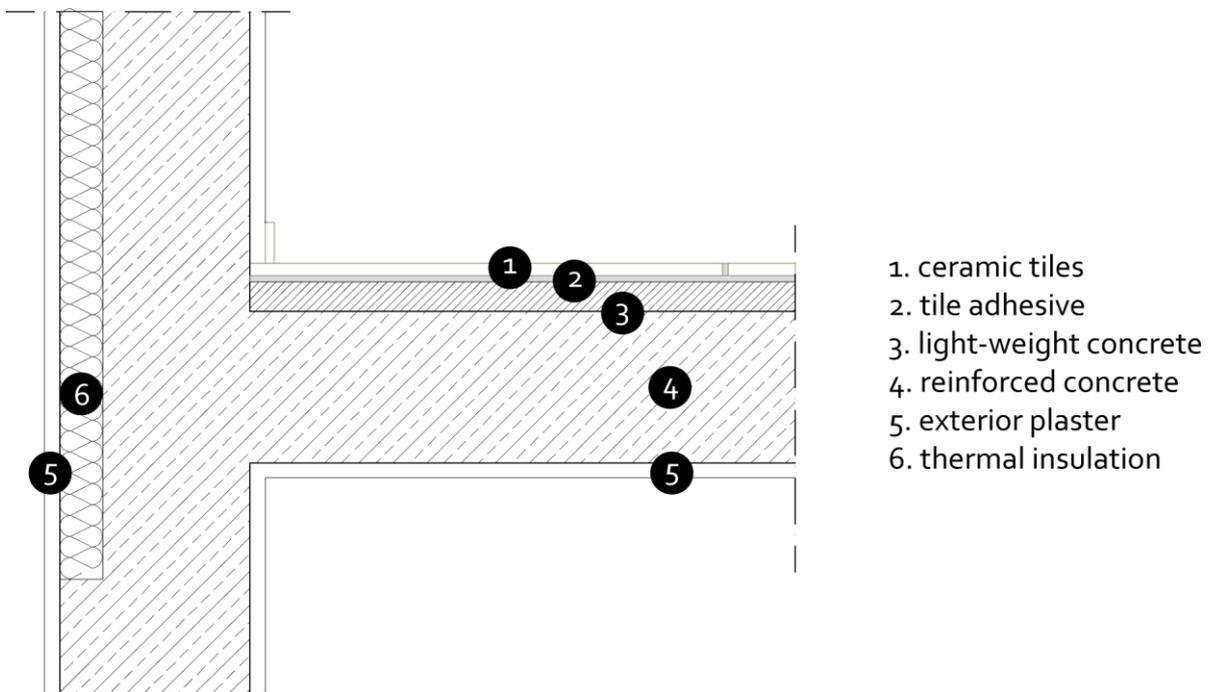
Common practice Pilotis - Buildings like MF₄ (161)
